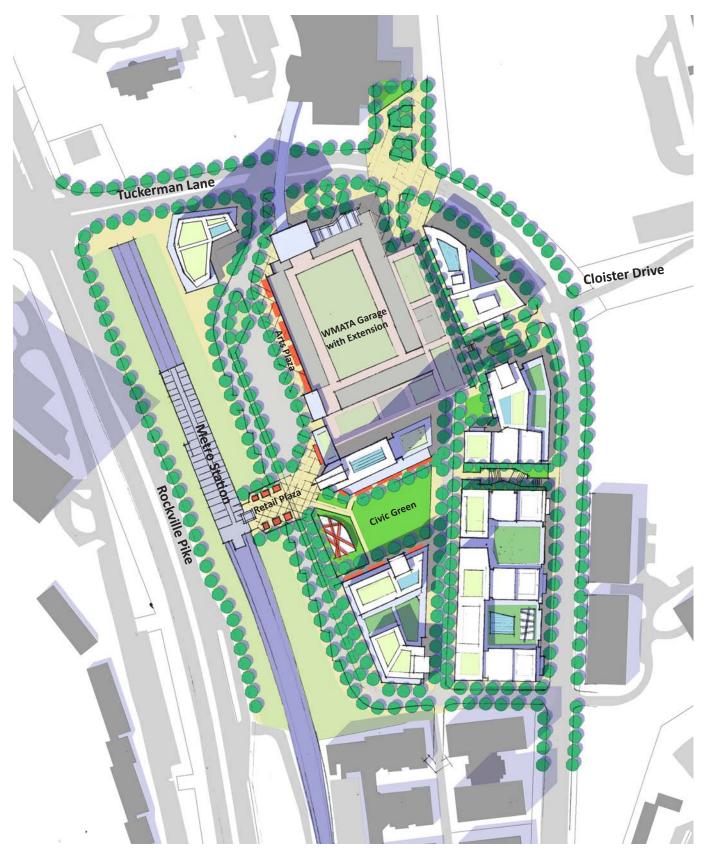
Illustrative Metro site plan (exact configuration of buildings and open spaces to be determined through the Optional Method Site Plan Approval Process under the recommended CR zone).
